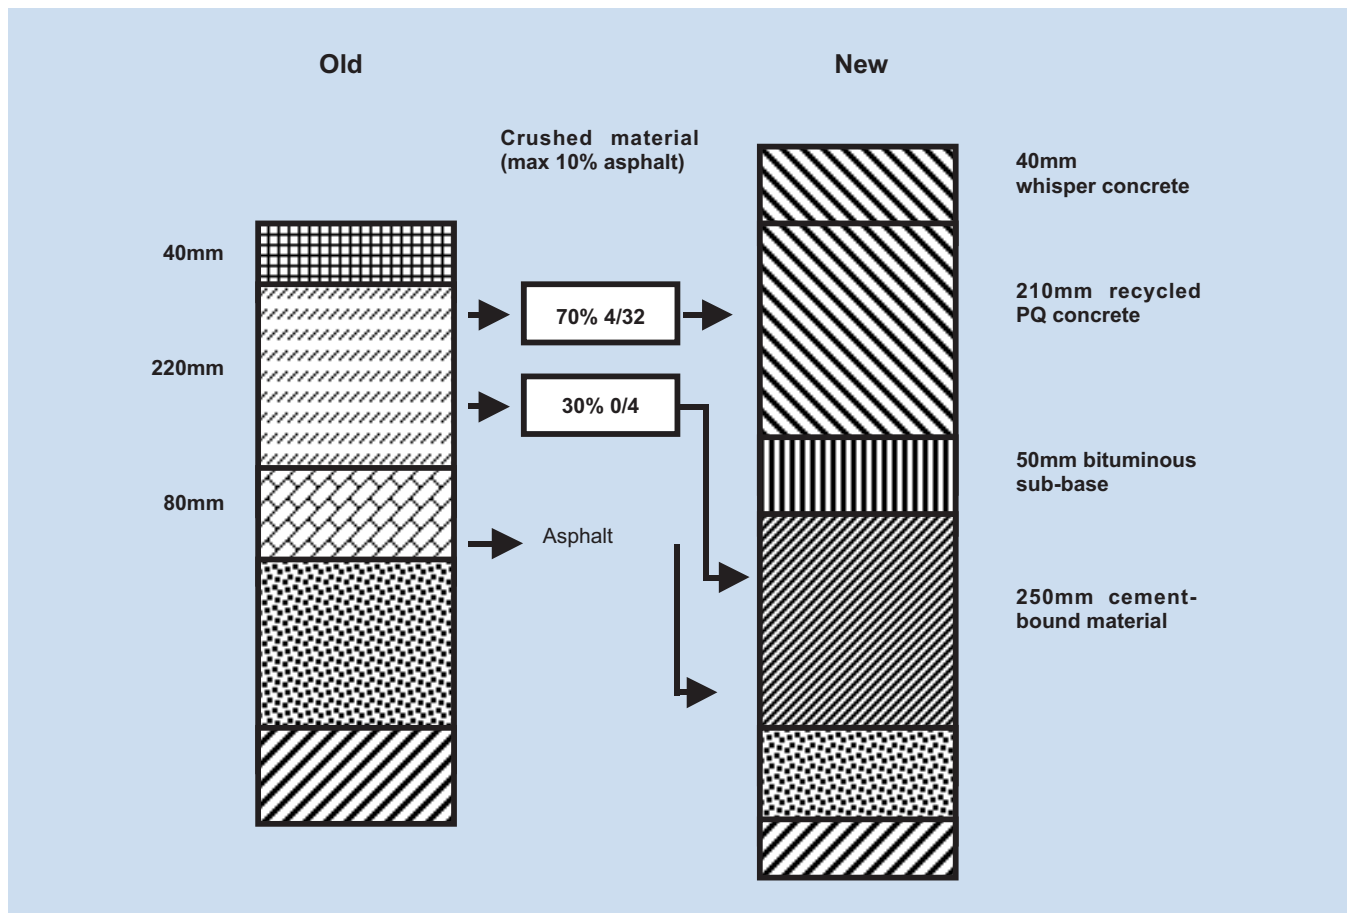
Schematic of the Austrian recycled PQ concrete pavement
